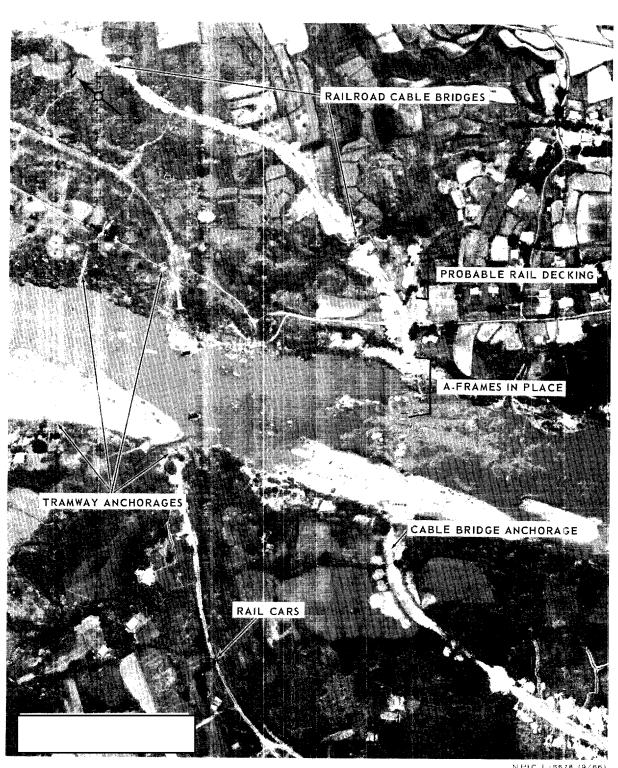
RAILROAD CABLE BRIDGE, VINH/DONG HOI RAIL LINE, NORTH VIETNAM.
